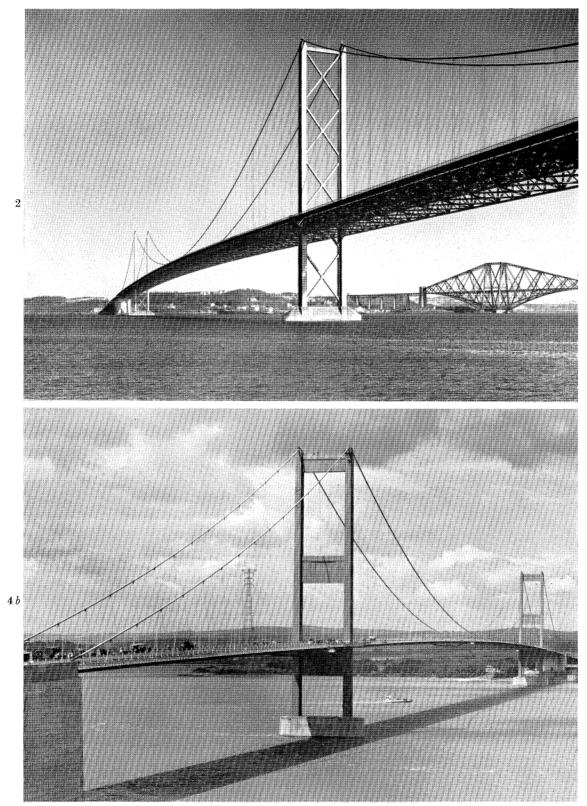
Forth Road Bridge. FIGURE 4b. Severn Bridge.
